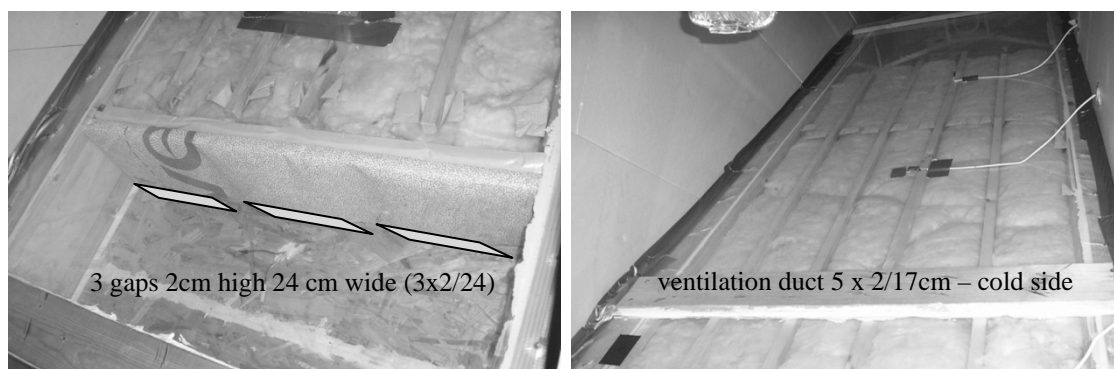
Cold side of the test roof element – eave variation and air flow channel above the thermal insulation.
